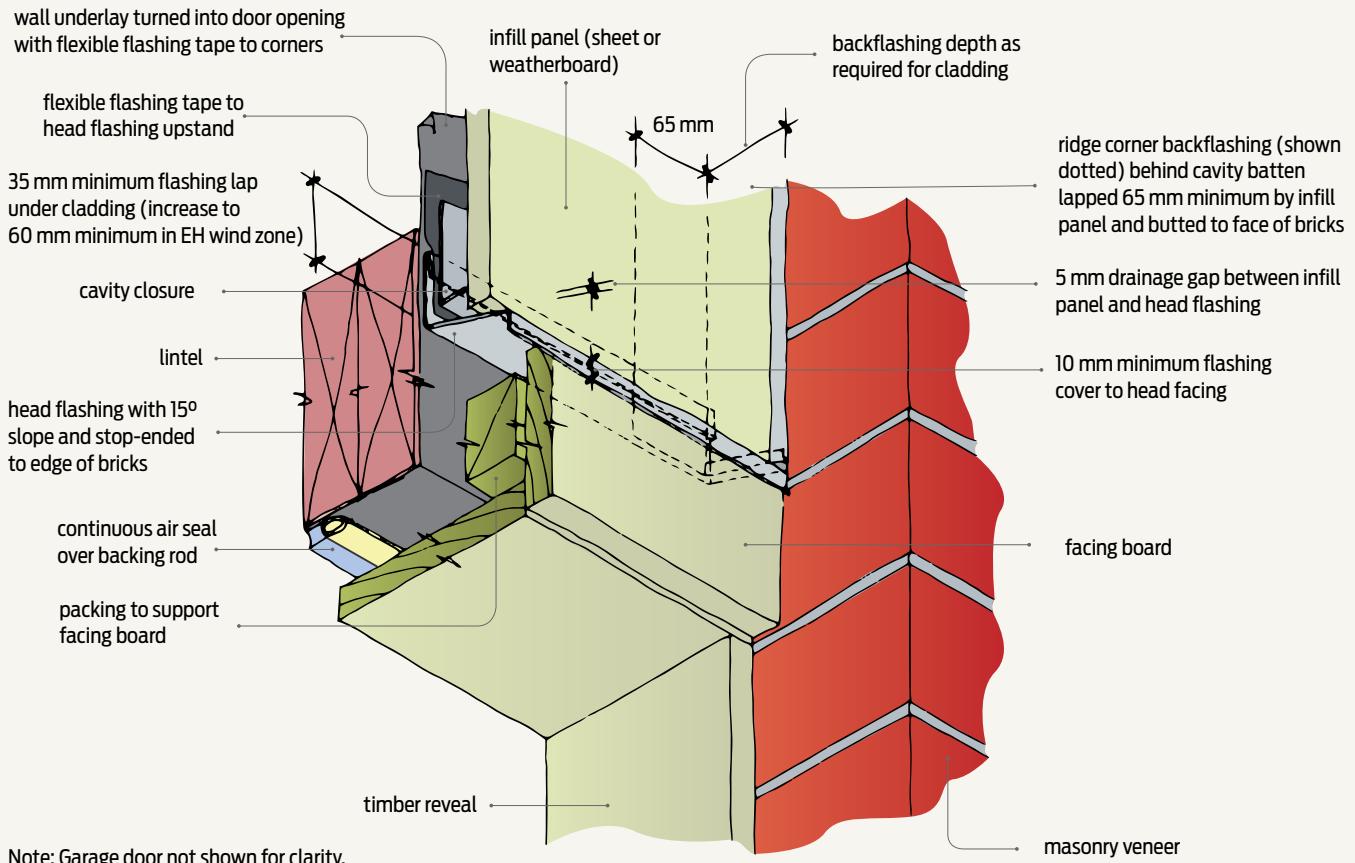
Garage door head detail with masonry veneer cladding and infill panel over the door.
